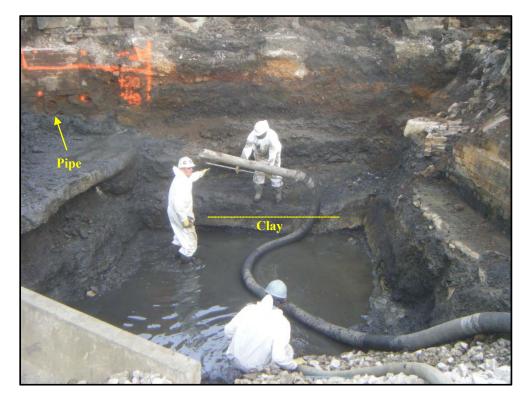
Photograph (4) of SU12 South of Vertical Pipe Stand (East View)
